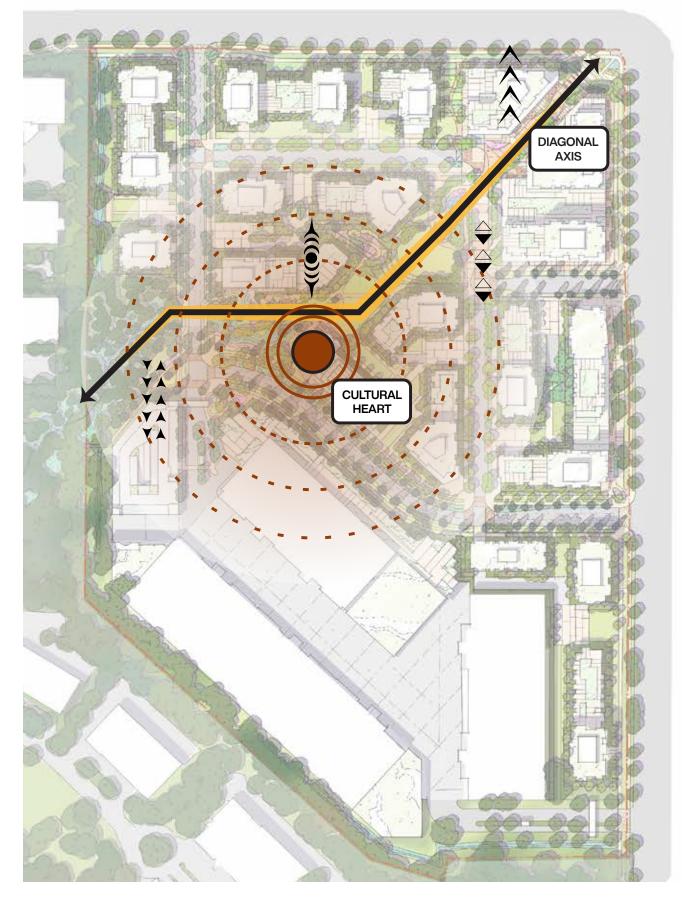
SITE PLAN -DESIGN DIRECTIVES
